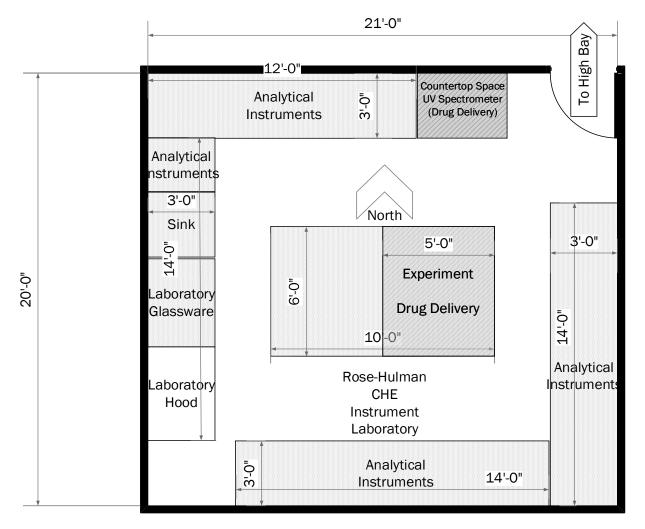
Instrument Laboratory (O-200B) Floor Plan
